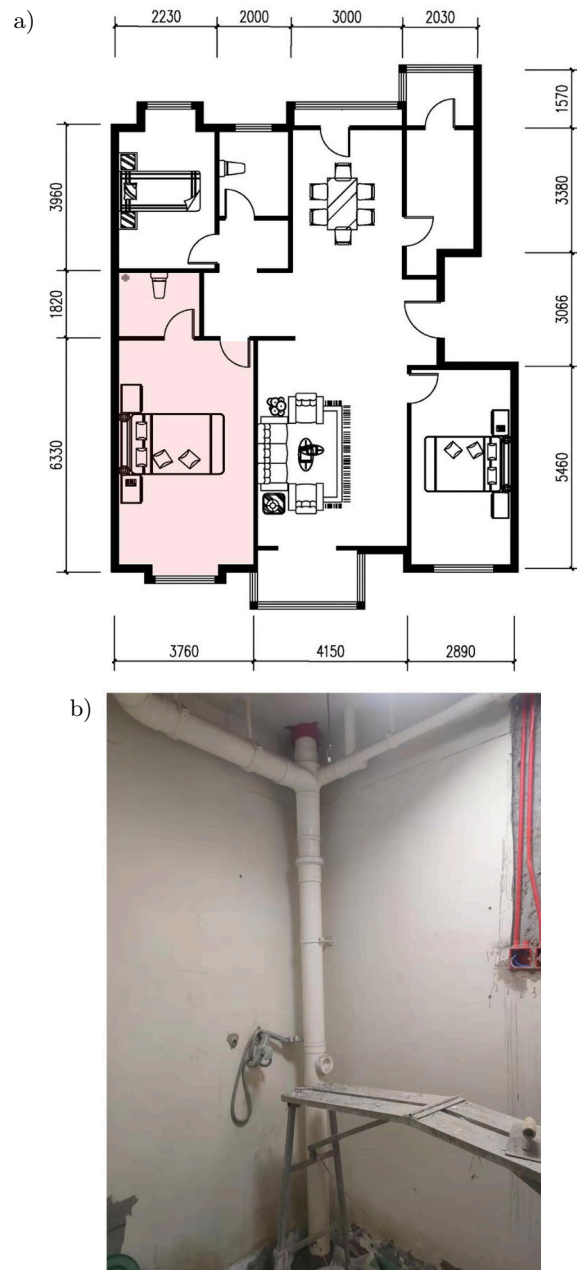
Test condition master bedroom suite: a) plan layout of test condition; b) master bathroom riser.
